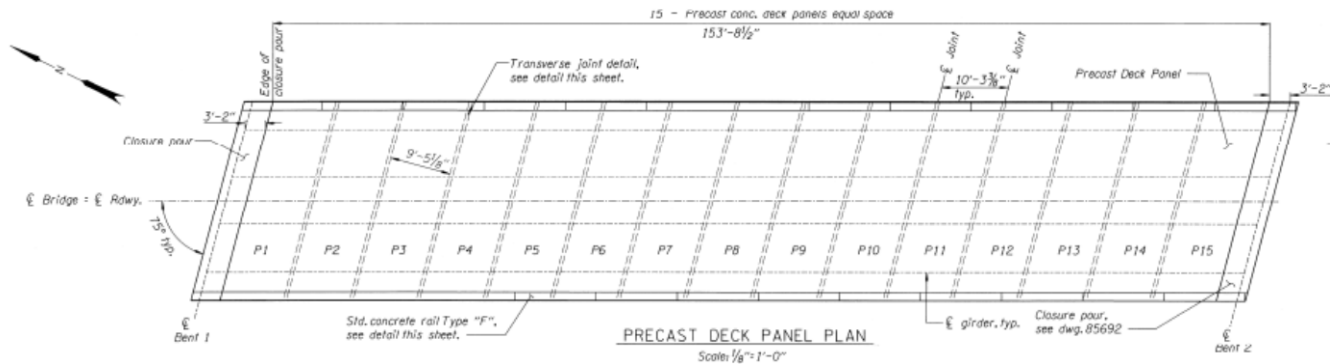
Diagram. Precast deck panel plan of bridge 21252.
